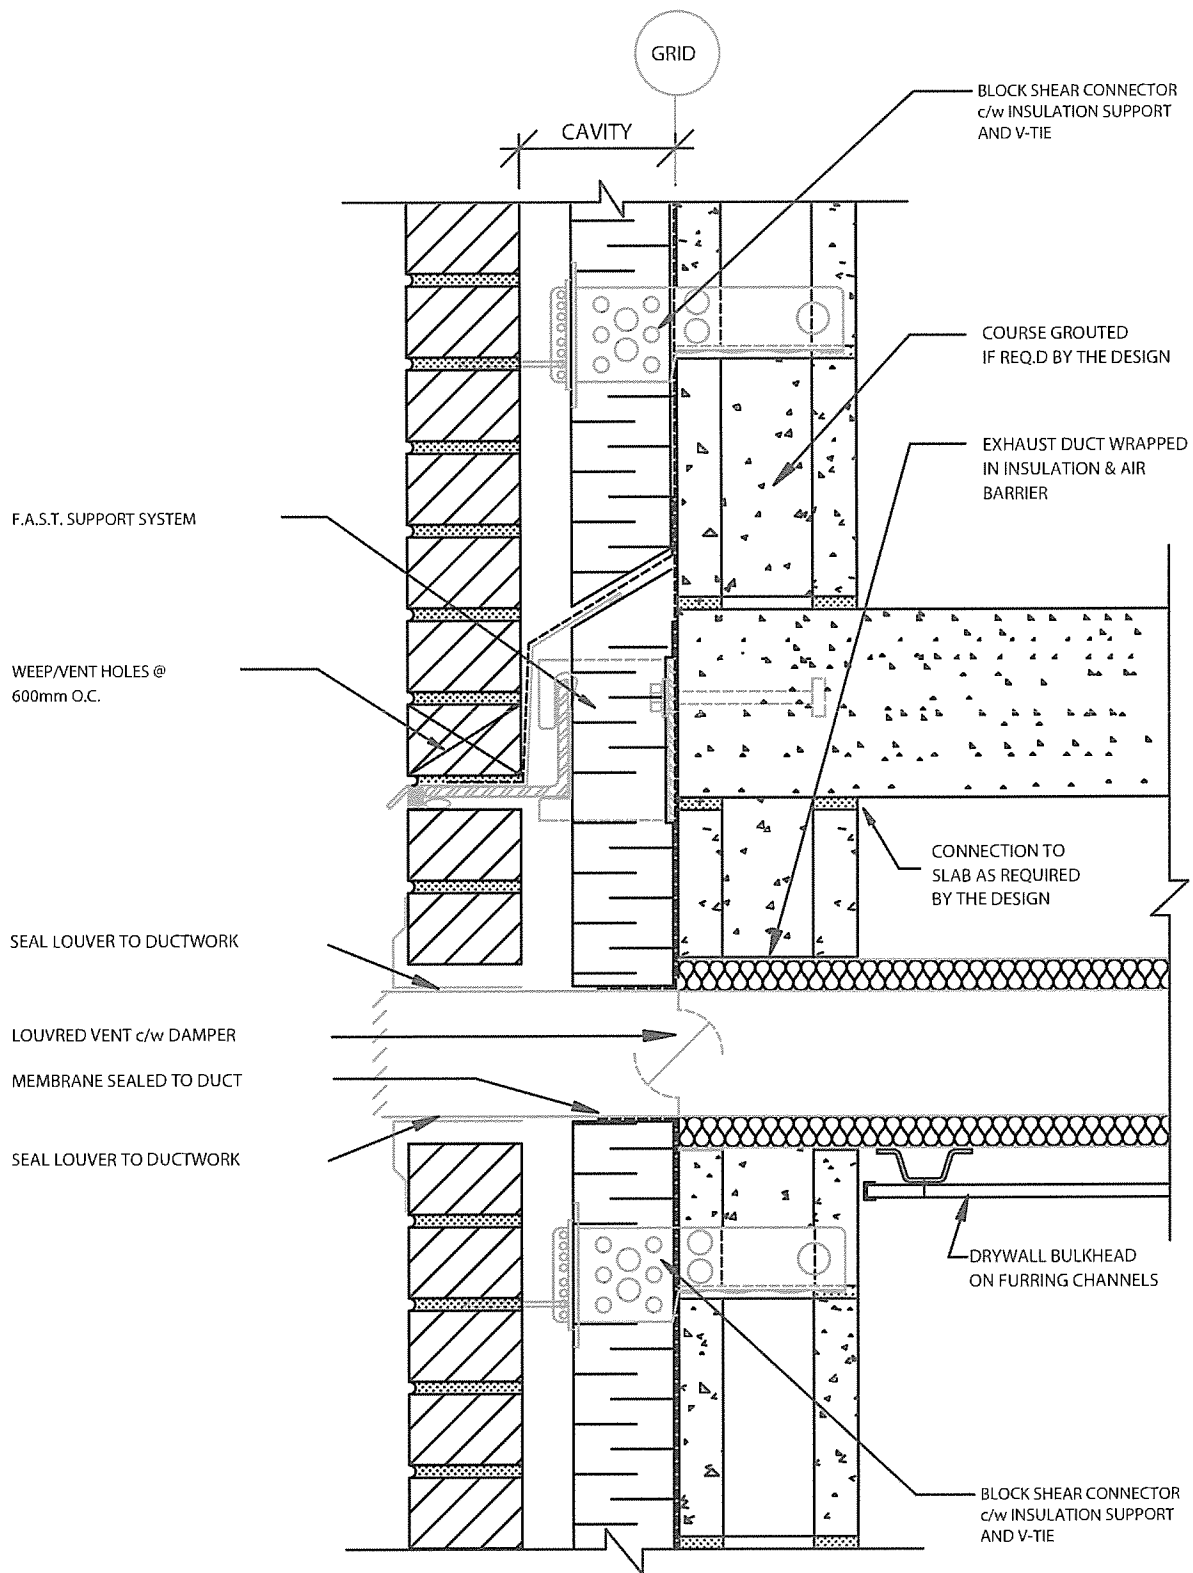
BRICK VENEER/CONCRETE BLOCK-EXHAUST VENT DETAIL
